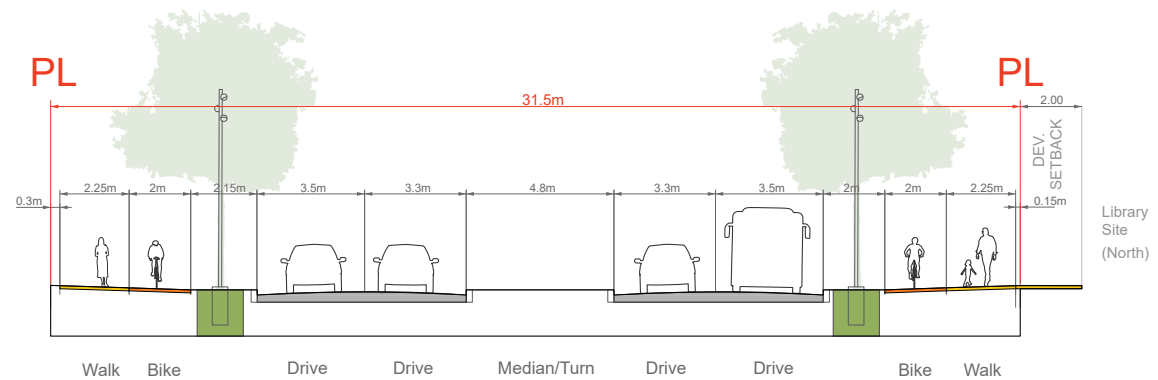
| Planned improvement to Albert Street, Empress to Booth (31.5 m)
